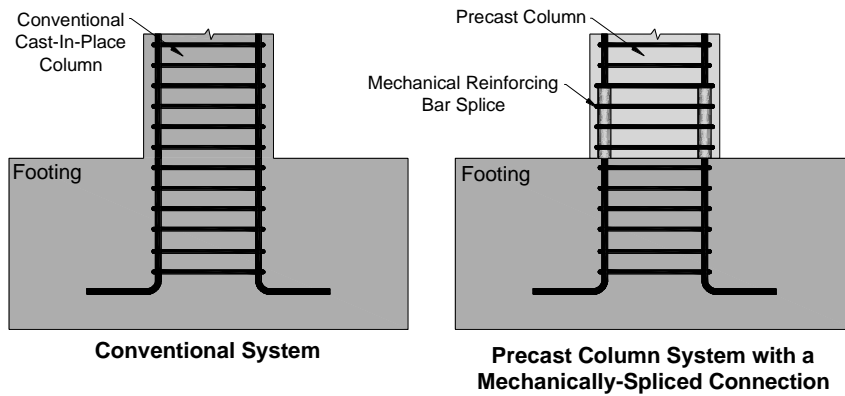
Comparison Between Conventional Bridge Column Connections and Mechanically Spliced Precast Column Connections
